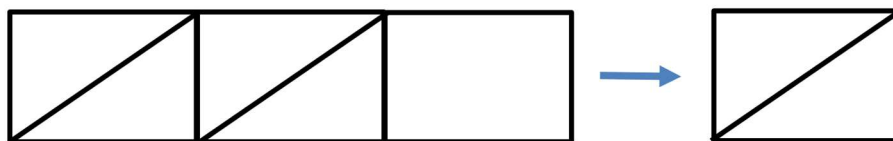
Four Girder, Two Z-Frame Lean-On Bracing Stiffness Idealization
